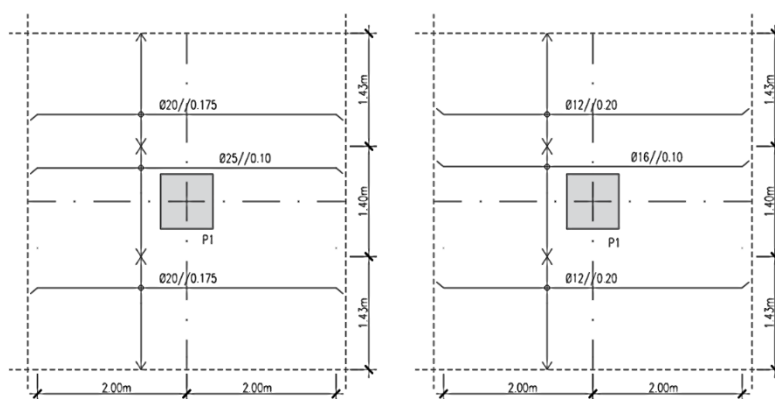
Longitudinal reinforcements. Left: Top reinforcement; Right: Bottom reinforcement.
